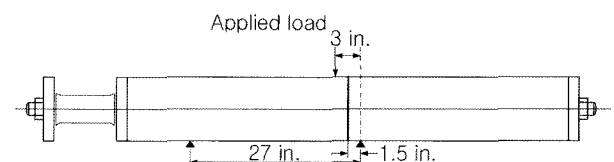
Plain butt joints and mortared joints test. (1 in. = 25.4 mm)
